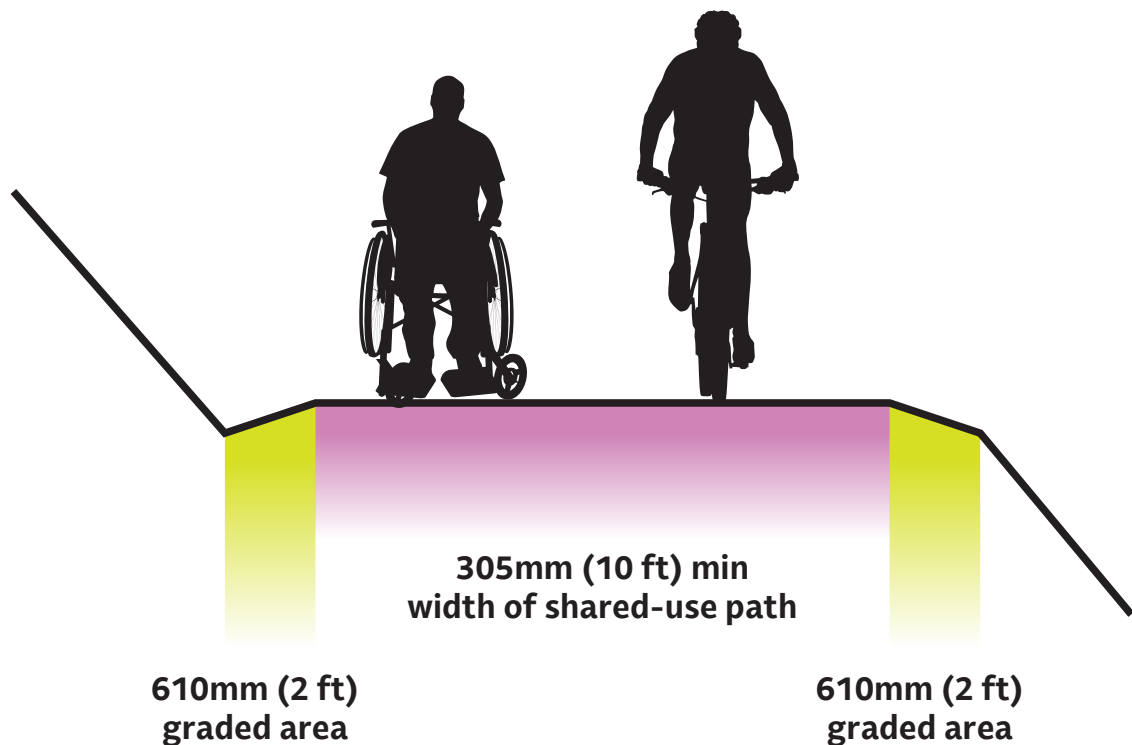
Shared use paths should be constructed to minimum widths of 10 feet image
